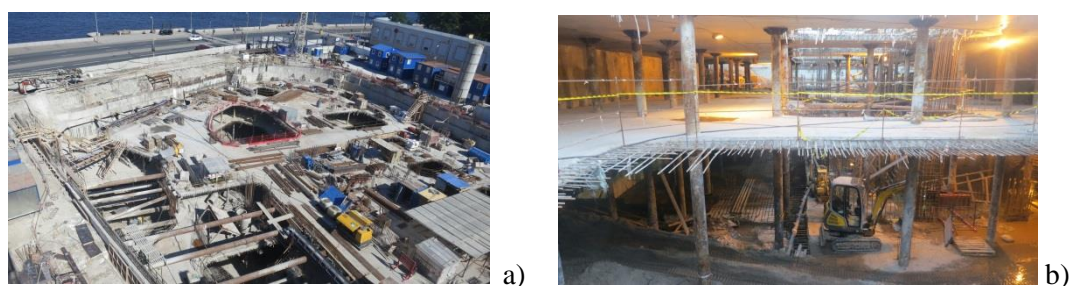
View of bracing structure in the form of struts (a) used in construction of Pravda-the Renaissance Office Center and reinforced concrete beams (b) on construction site of Business Center at Suvorovsky Pr. 2 (Semi-Top-Down construction technology)
